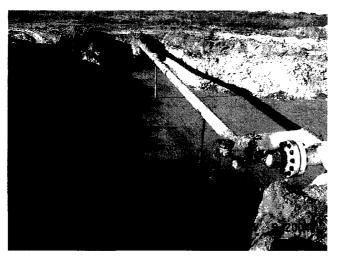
Installation of clay liner in western portion of excavation, looking easterly.
